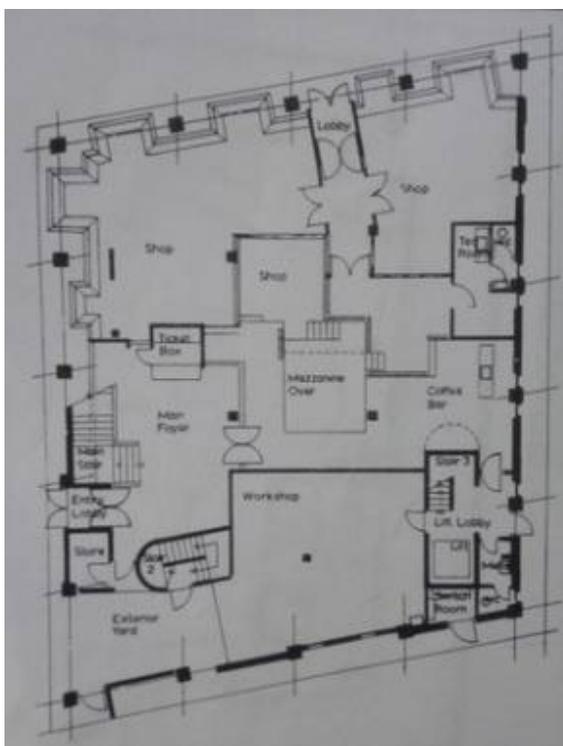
Ground floor plan of the Hannah Playhouse. (*Designscape*, Nov 1973, p. 4)
